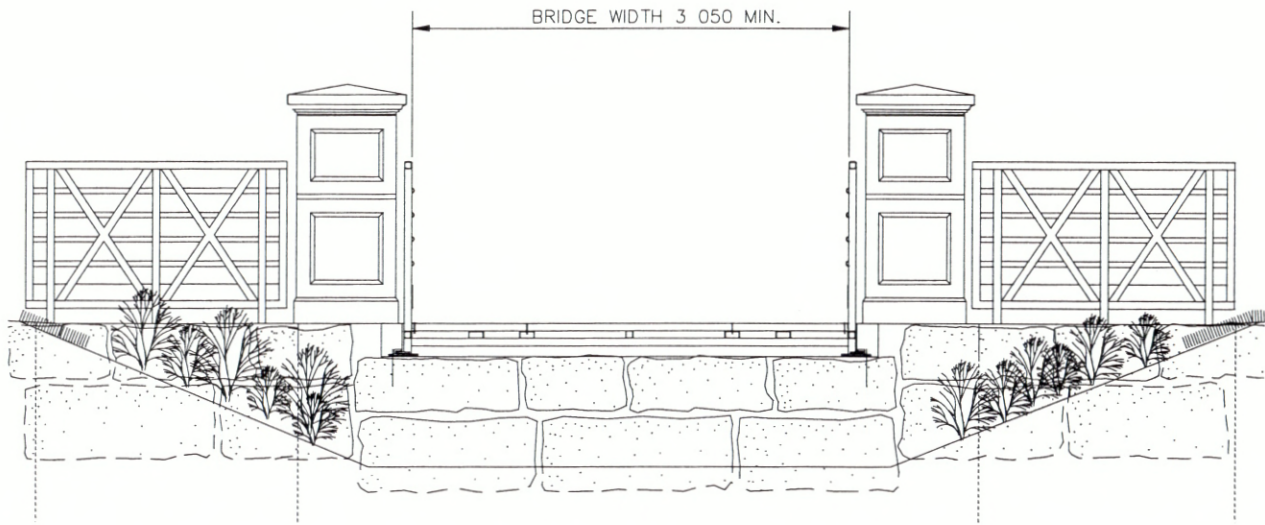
ELEVATION OF PEDESTRIAN BRIDGE ENTRY N.T.S.
